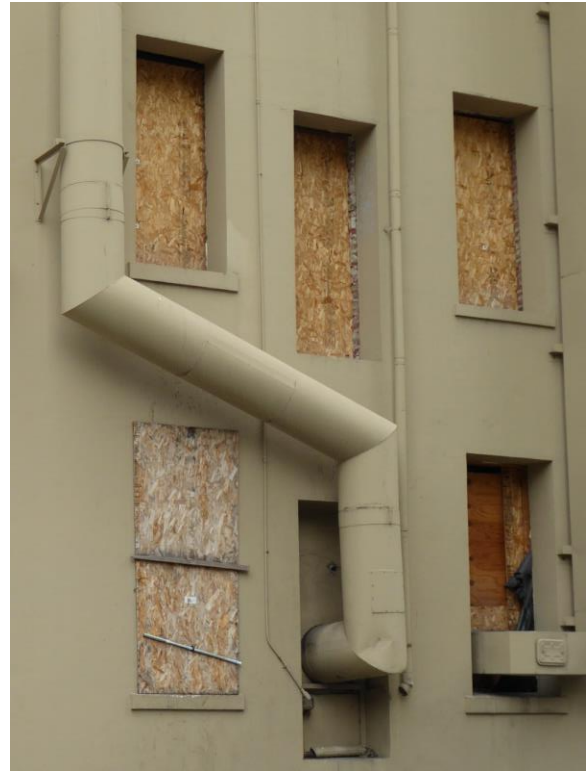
Detail photograph of ventilation ducts projecting through second floor openings. Note size difference between window and door openings (photograph taken on 01/26/2018).
